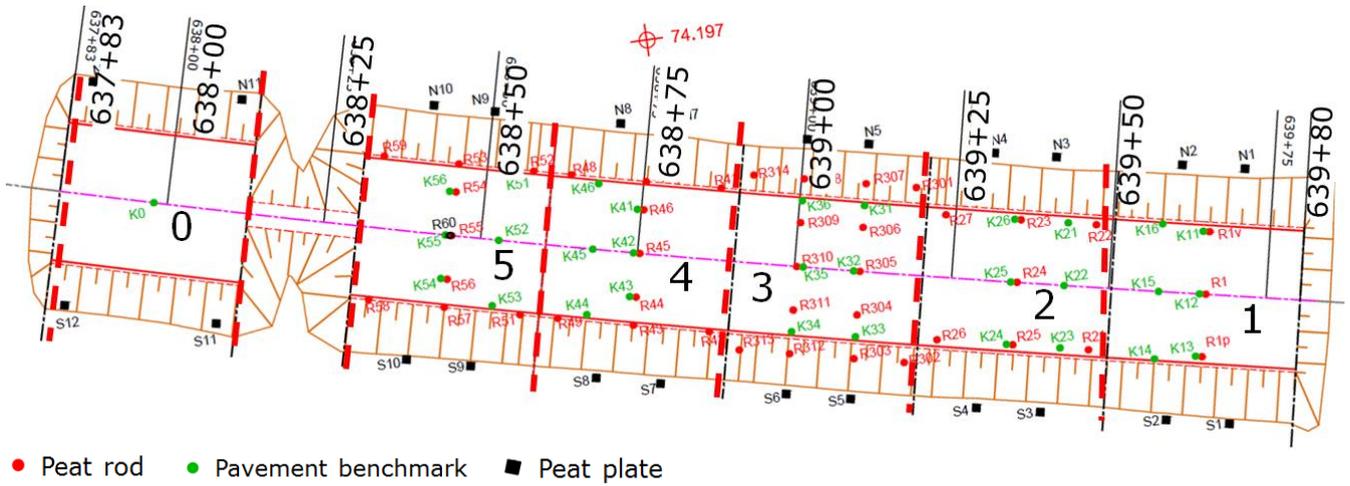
Locations of the leveling benchmarks (red –peat rods, green –pavement benchmarks, black –peat plates, and also the Section 0 slope plates) (Ellmann 2015)
